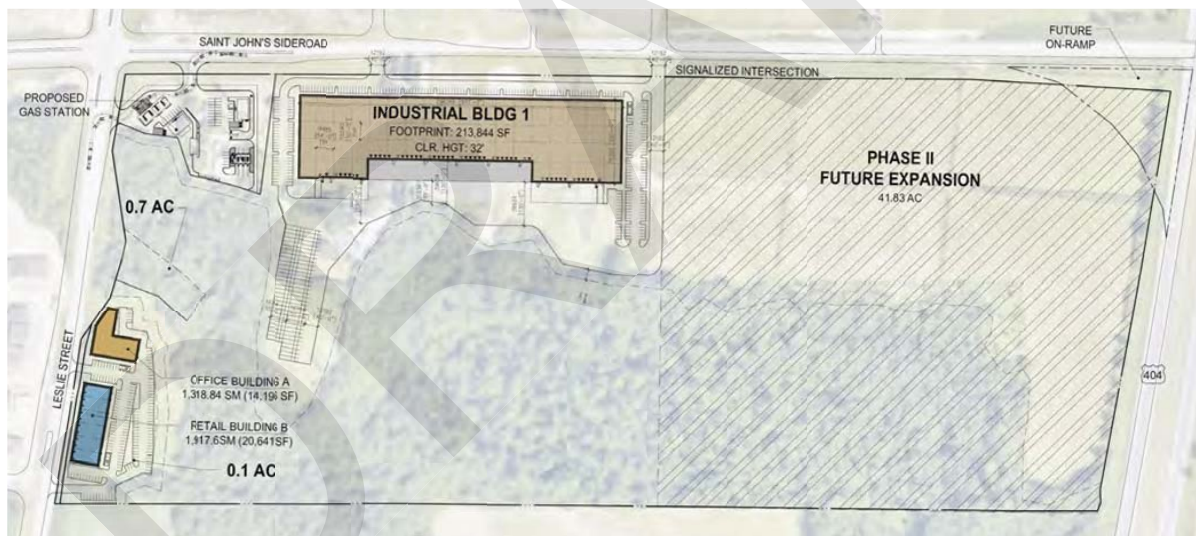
Proposed Site Plan (Ware Malcomb, 2018).
